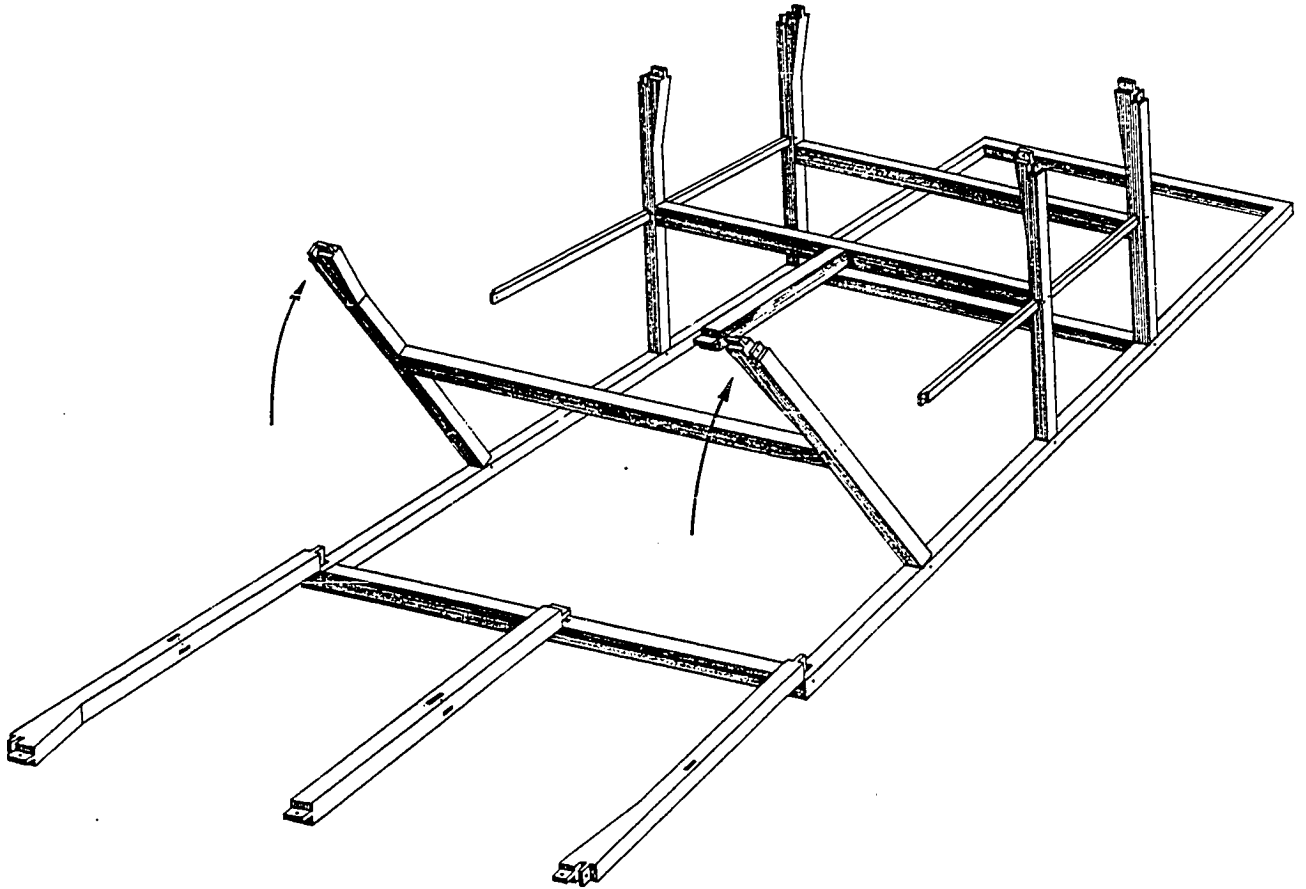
Rearing the bent frames of a two story house with crossed summers. The Gedney house, Salem, Massachusetts, c.1665. From the near to far end, the house consisted of a two bay kitchen, a chimney and lobby bay, and a leanto parlor. Cummings, Framed Houses, p. 82. Illustration copyright: Harvard University, 1979. Reprinted by permission.
